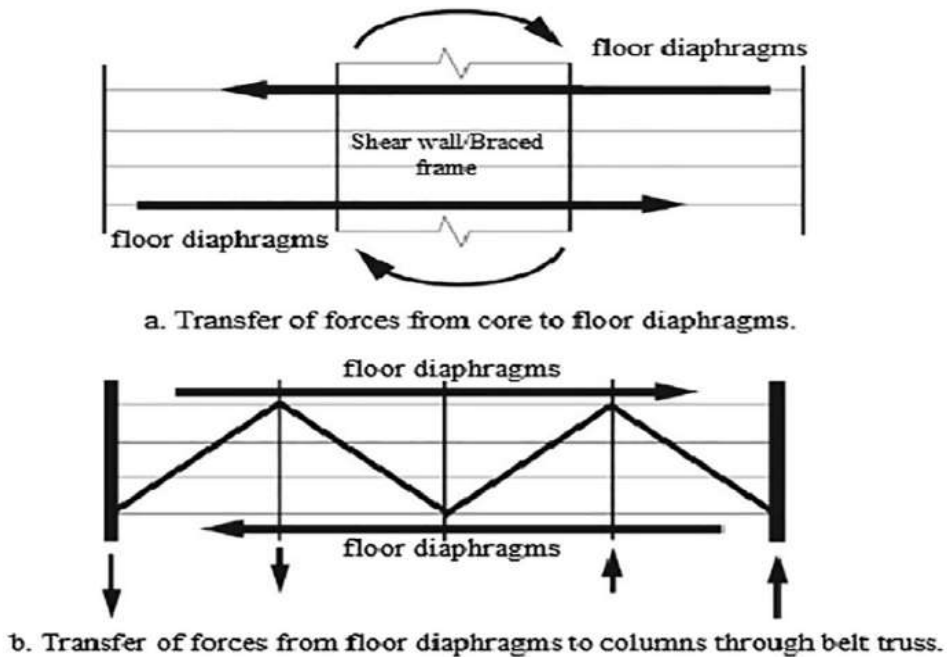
Lateral force transfer in Outrigger and Belt Truss system[2]
